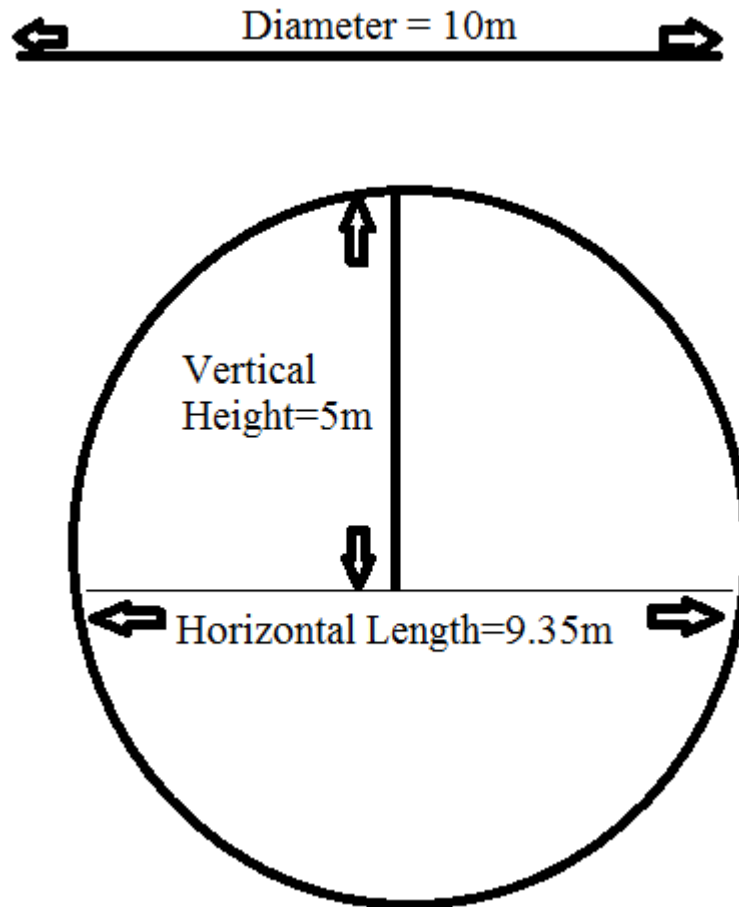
Cross-section of the Chenani-Nashri tunnel (Source: Facibeni et al. 2011)
